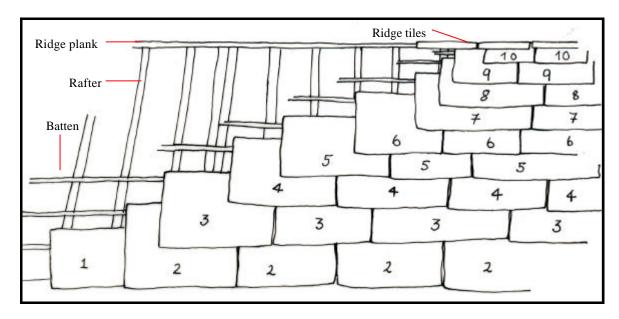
Diagram of simple vernacular roof type with roof of collared rafters, showing rafters, battens, ridge tiles & stone slates laid to diminishing courses.
